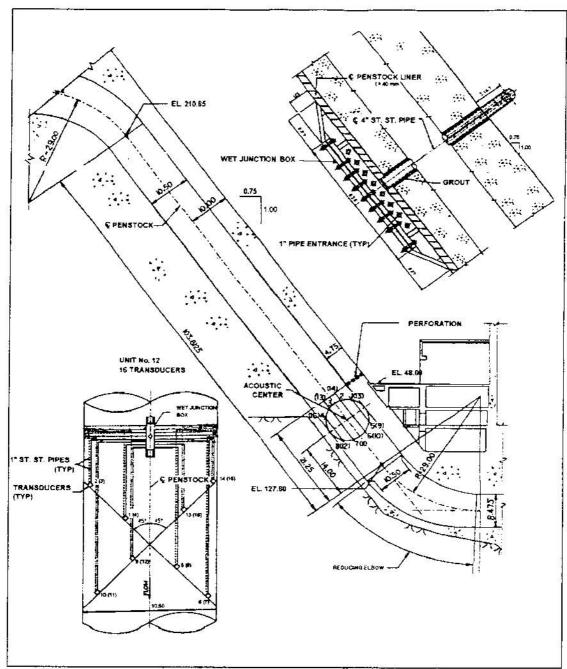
Guri Powerhouse No. 2 - Acoustic Transducers and Cables inside the Penstock
